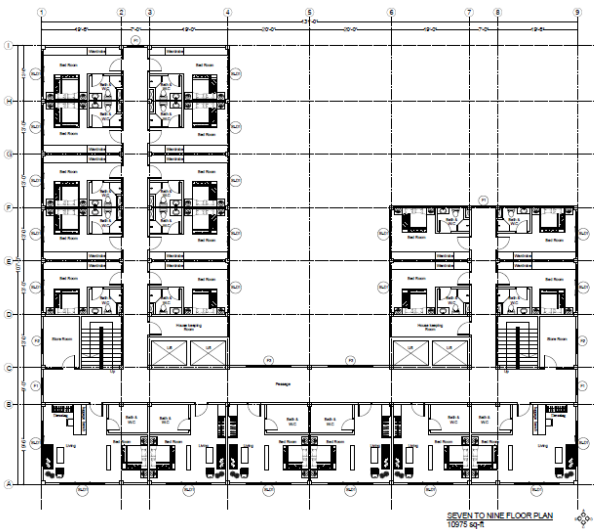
Architectural View for 7<sup>st</sup> to 9<sup>th</sup> Floor Plan
